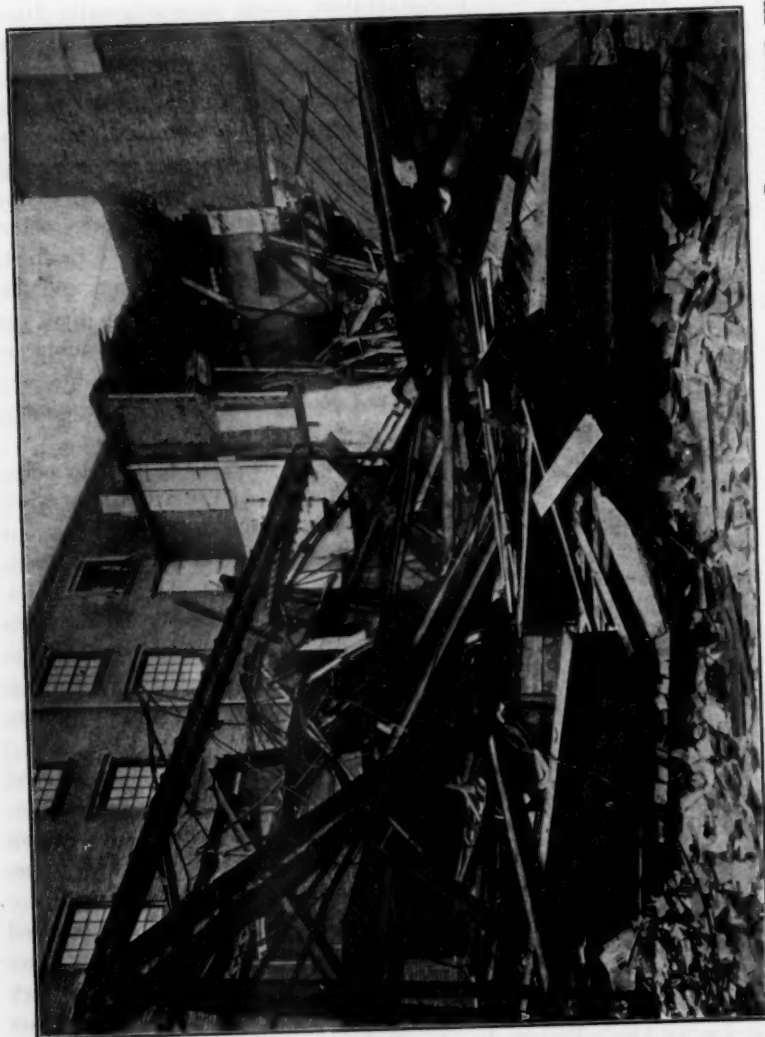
VIEW OF COLLAPSE OF STEEL TOWER STRUCTURE WITH LARGE WOODEN TANK AND DAMAGE CAUSED THEREBY
